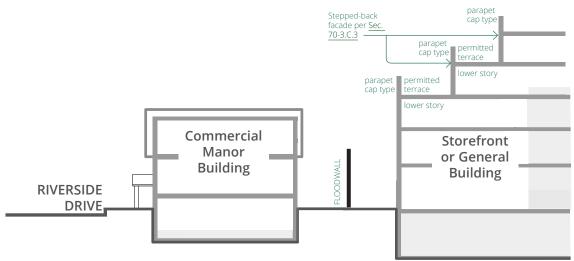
C-5. Illustration of Required Stepped-Back Upper Stories at Floodwall and Commercial Manor Building Type.
